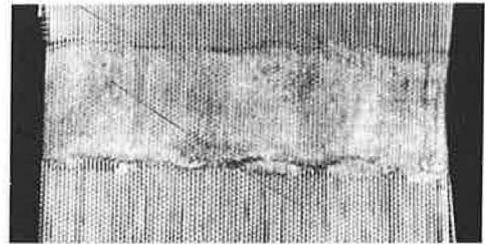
BONDED JOINT - GEOTEXTILE 'A'
